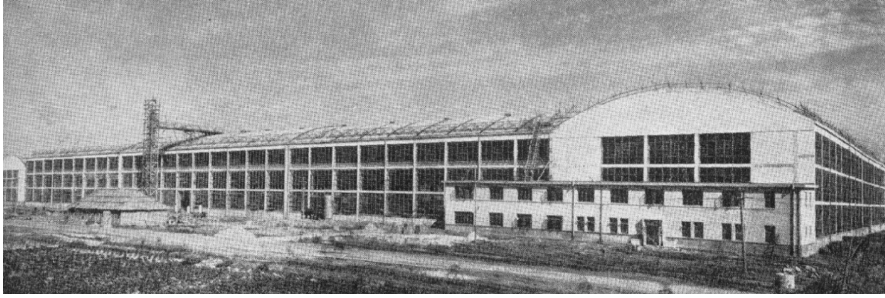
General view of the metal structure workshop, Shanghai Boiler Plant
